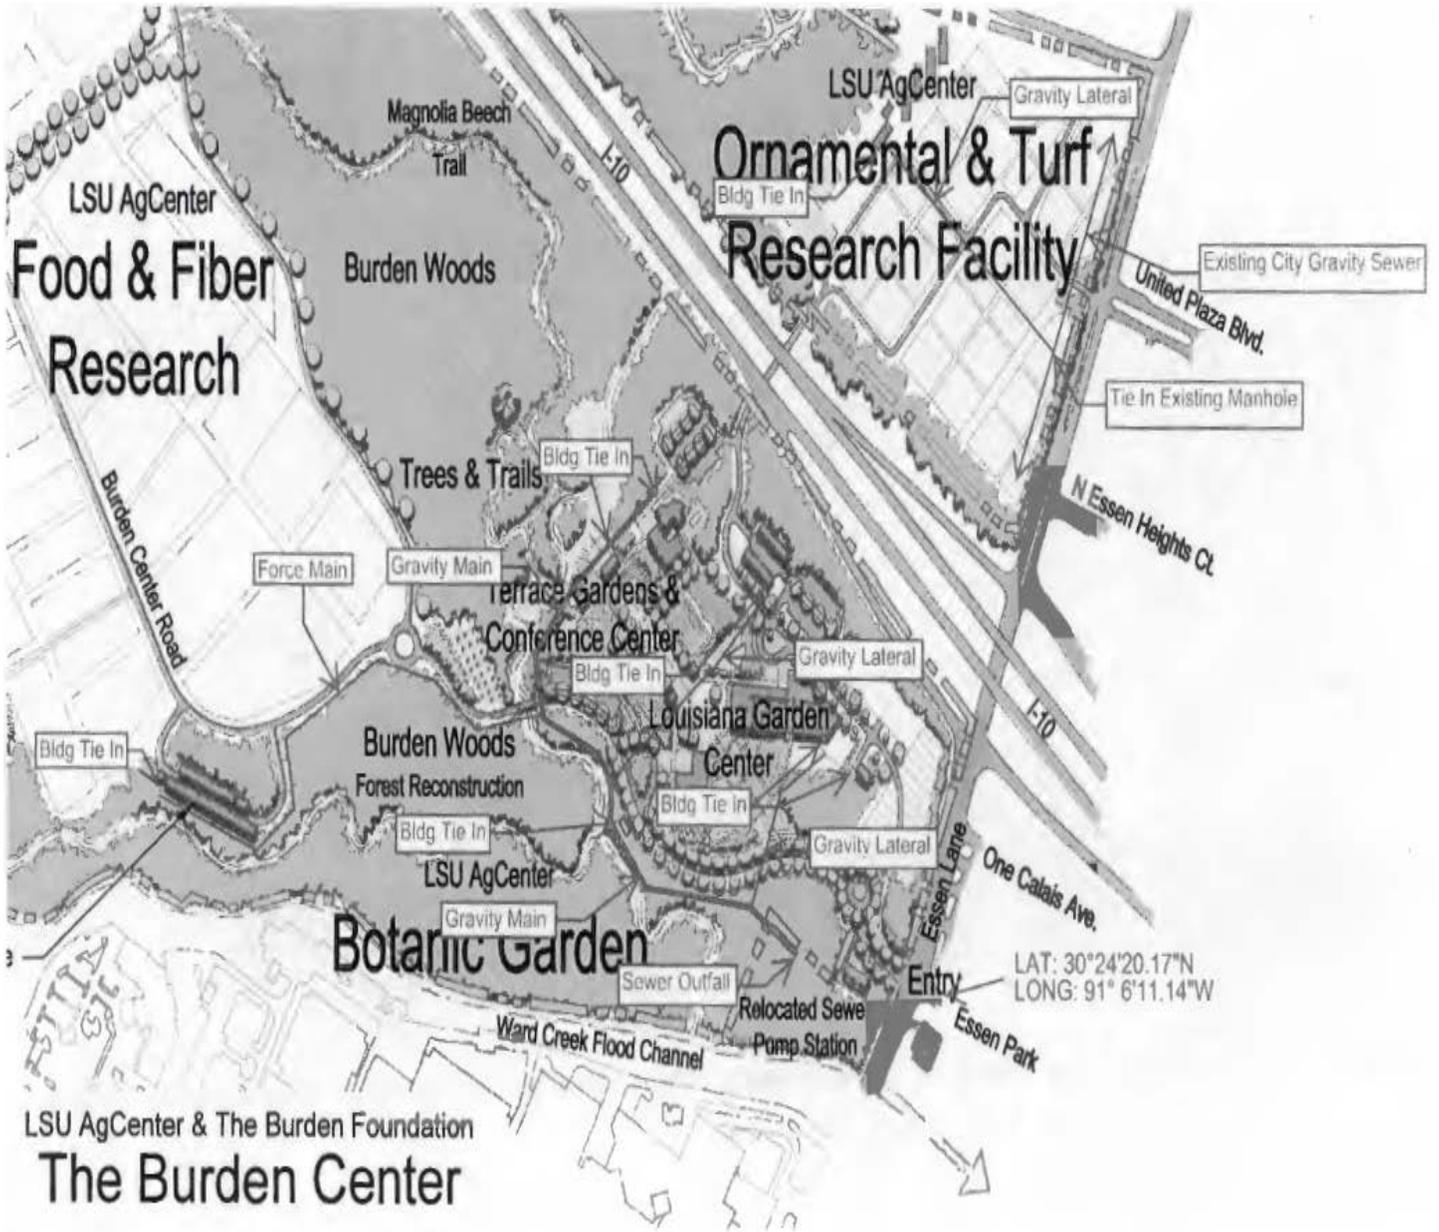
Facility Sewer Collection System Burden Center Site at Burden Center 4560 Essen Lane, Baton Rouge, LA 70809
